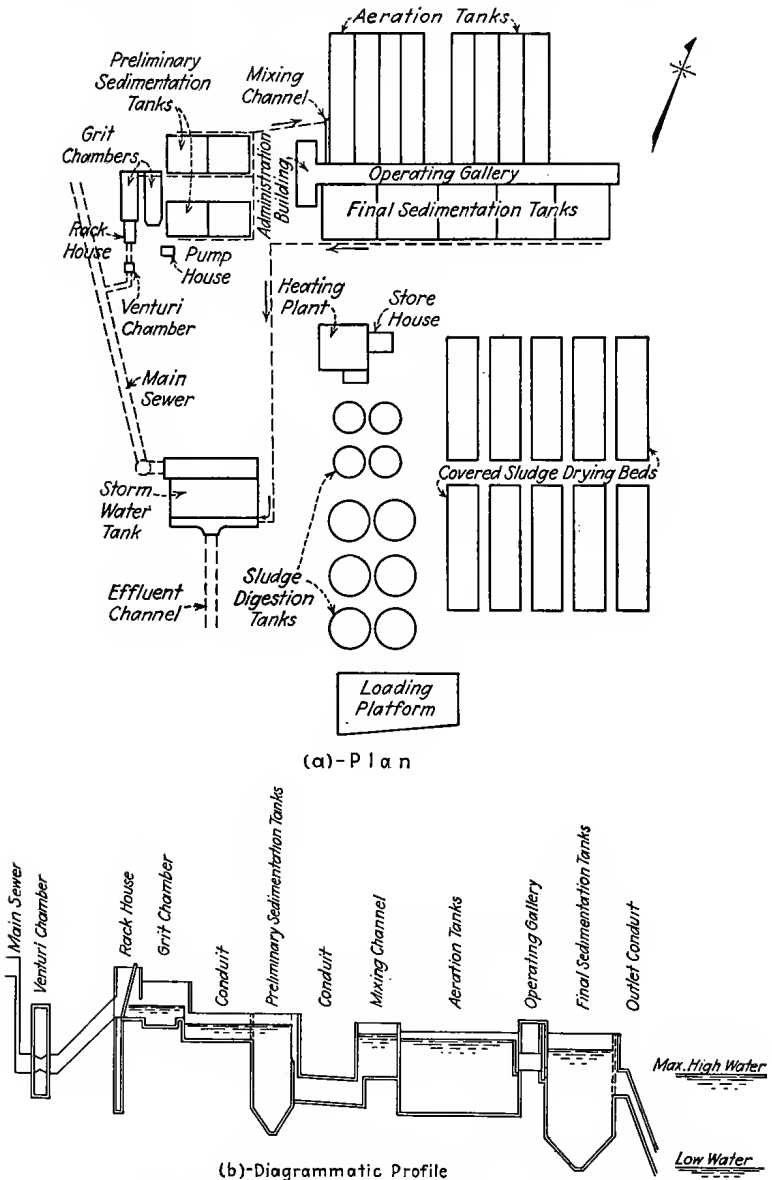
Activated-sludge plant at North Toronto, Ont.
